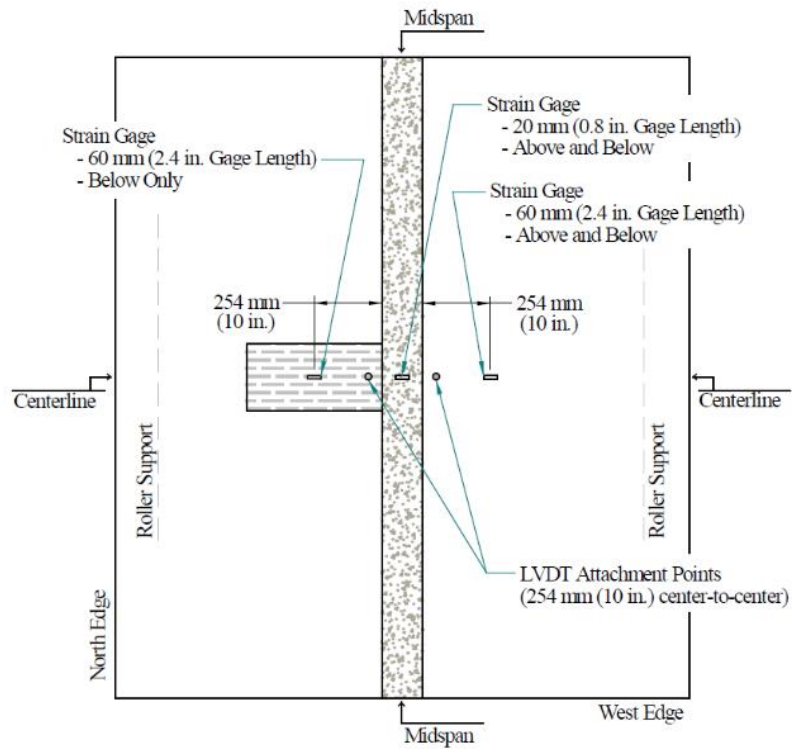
Layout for longitudinal joint specimen (Graybeal 2010)
